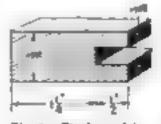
Cutaway view of the Inside corner of a elether closet details of construction
